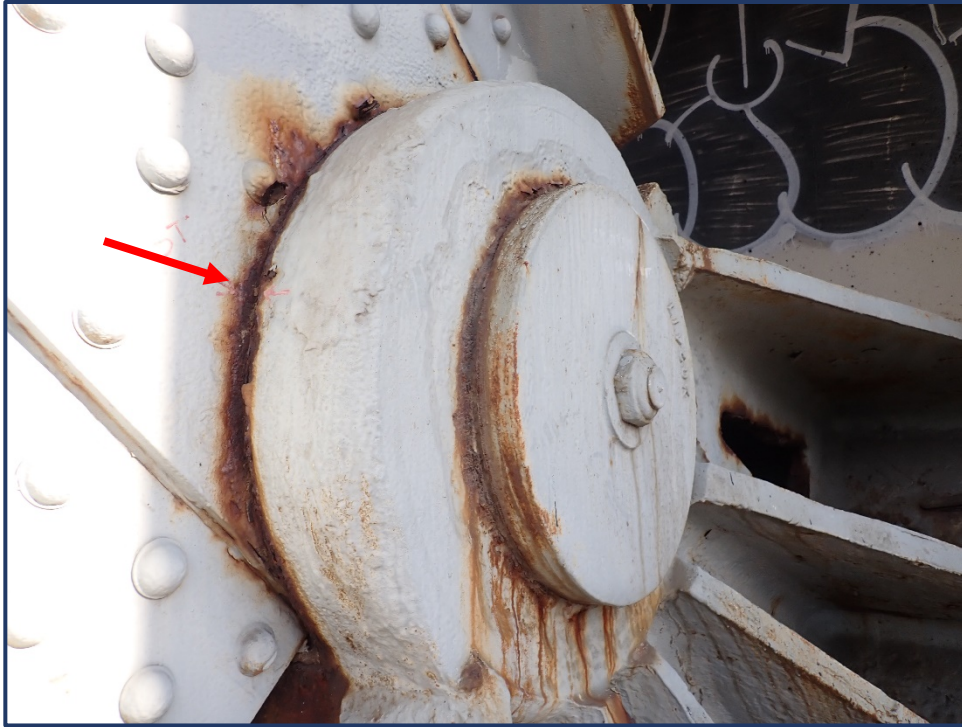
Span 4, South Truss, L0' Bearing, Pack Rust Around Pin
